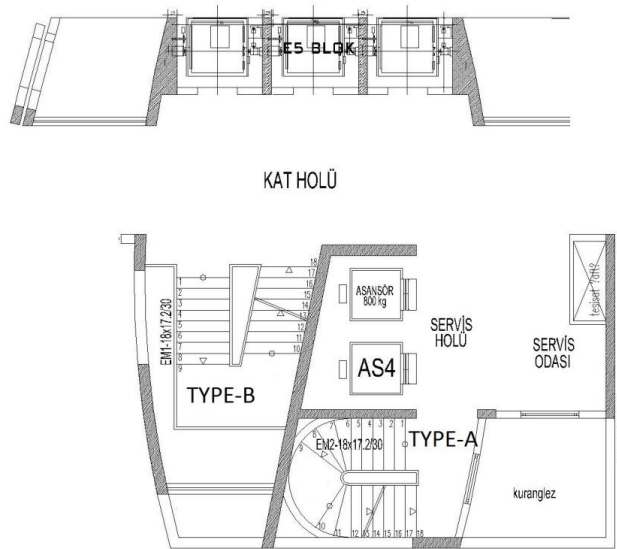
Type of staircase in the LPH construction site (A&B)
